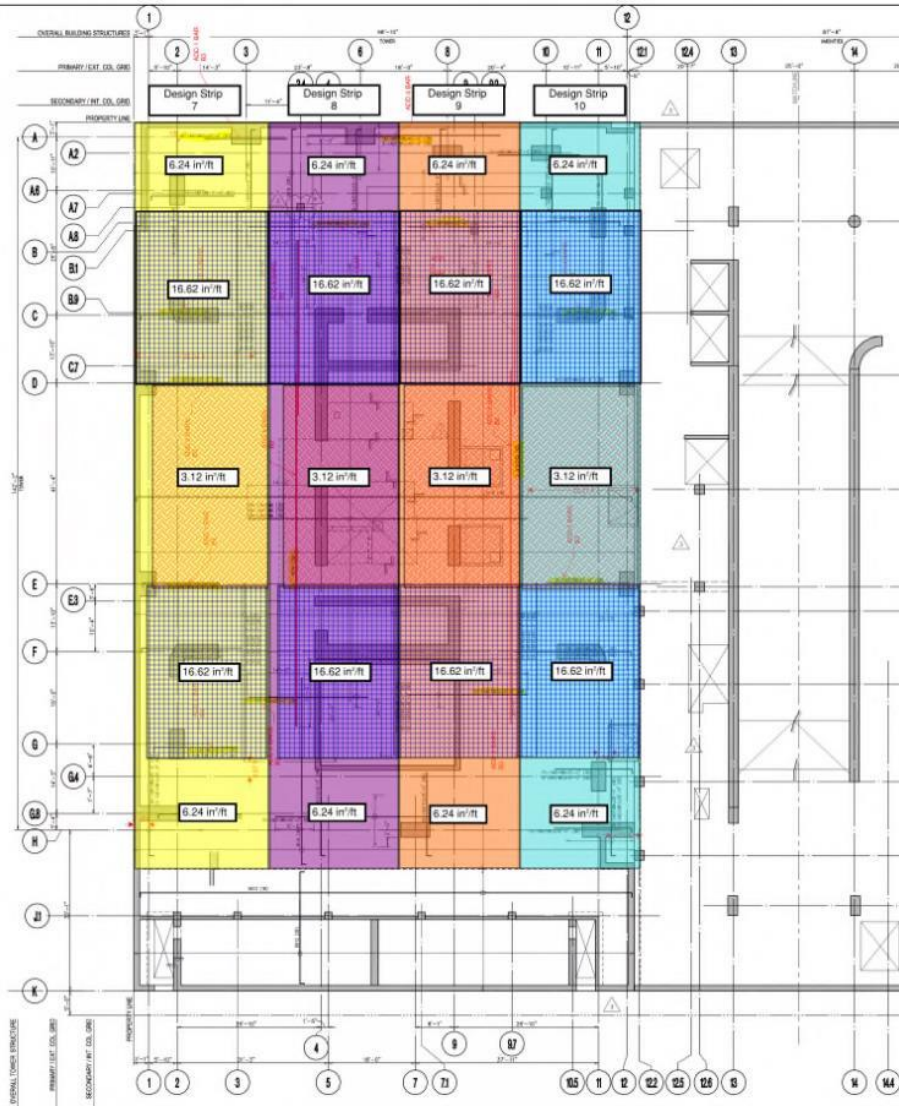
Design strip reinforcing in as-built pile cap (for design strips 7-10)
